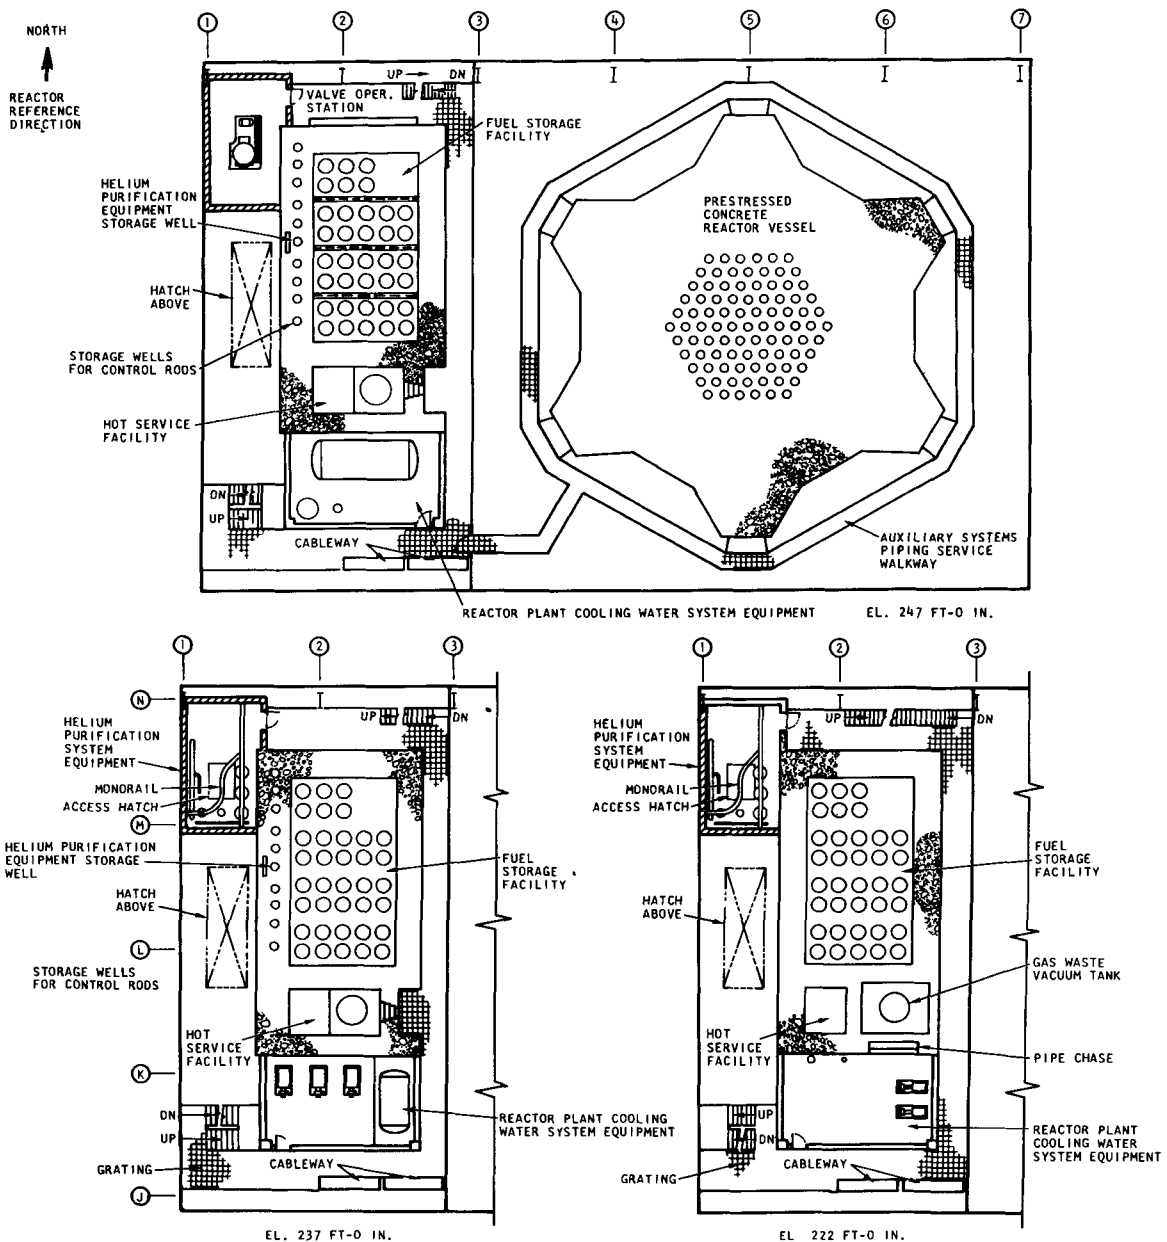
Reactor Plant Arrangement, Twin Unit Plans. (GGA illustration)
